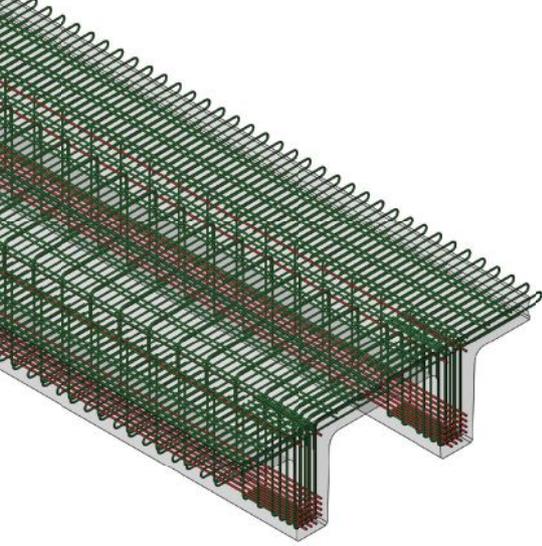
Isometric view of the end of a typical NEXT D beam designed using conventional concrete. Reinforcing bars and prestressing strands are shown. Figure: e.construct.
